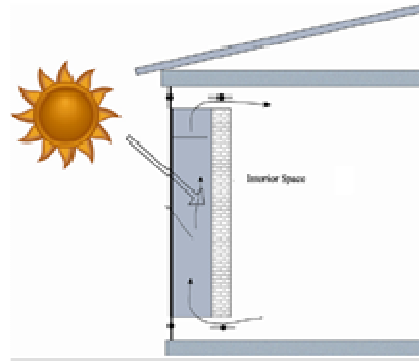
A: A gangway with windows in its sides resembles a solar wall
